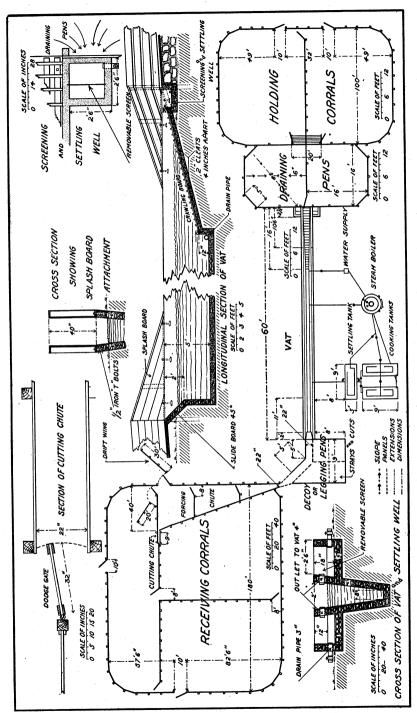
Plan of sheep-dipping plant; concrete vat.
